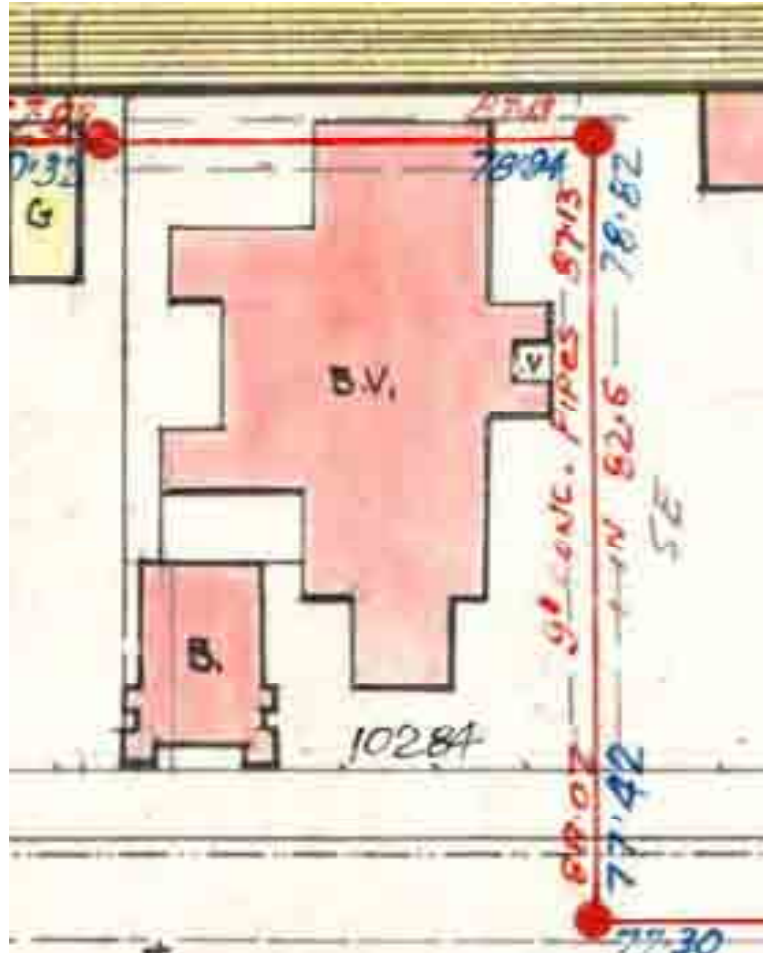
Part of Geelong Waterworks & Sewerage Trust Detail Plan no. 85, c.1912 (revd. 1914, 1917 & 1967), showing the electric substation on the Waratah Street boundary, with the dining hall to the immediate east. Source: Barwon Water collection.
